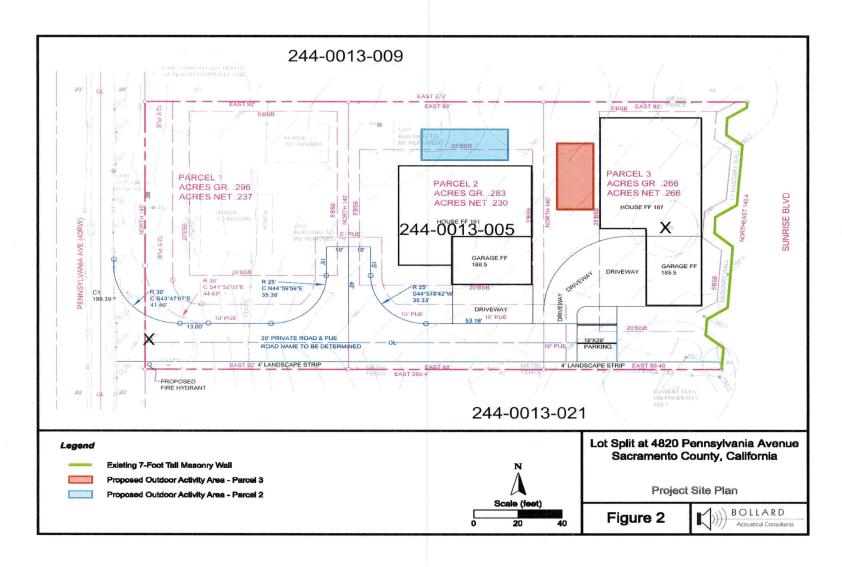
Project Site Plan with Proposed Outdoor Activity Areas
